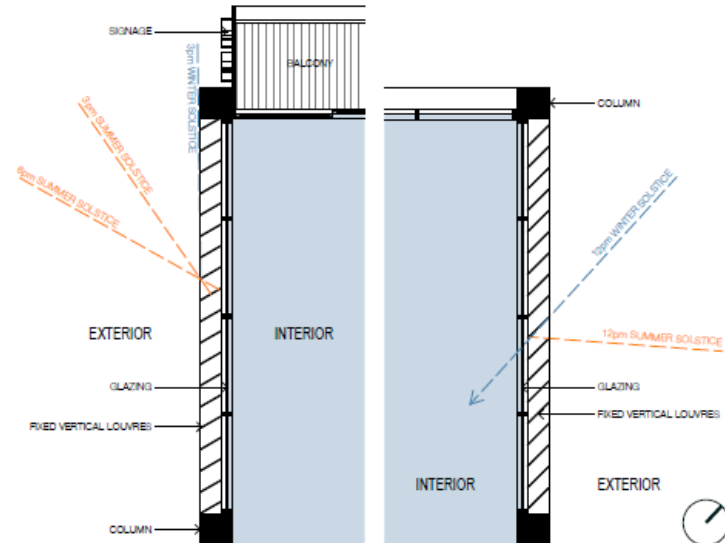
PLAN - West Facade - Fixed Vertical Louvres
